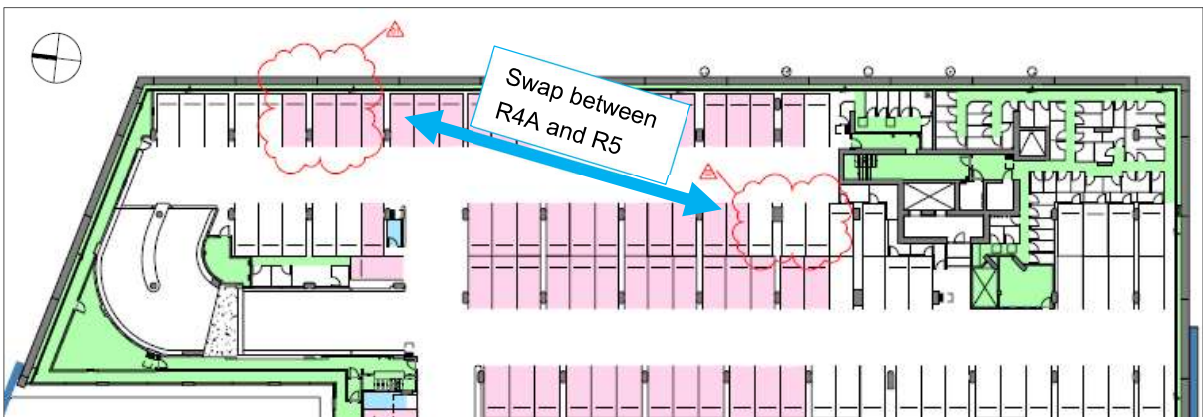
| Proposed plan of Level B3, with clouded pink spaces reallocated to Building R4A, and clouded white spaces reallocated to Building R5
